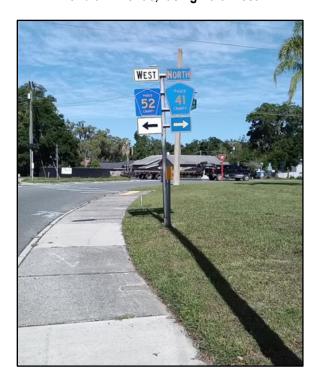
Buried utilities and sidewalk along eastern ROW of intersection of CR 52/21st Street and Meridian Avenue, facing northwest.
